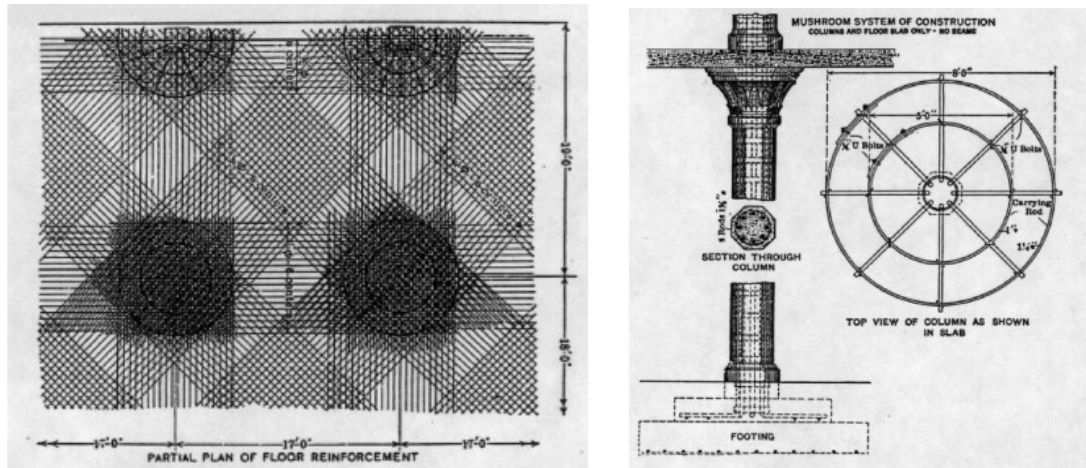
Mushroom flat slab detail CAP Turner [1]
